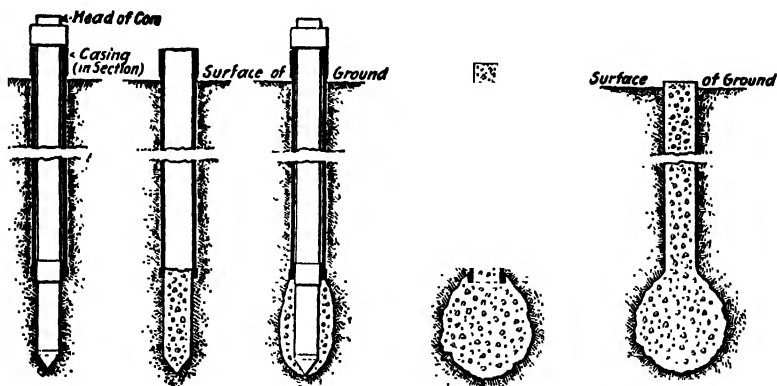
The Process of Forming Pedestal Concrete Piles.
